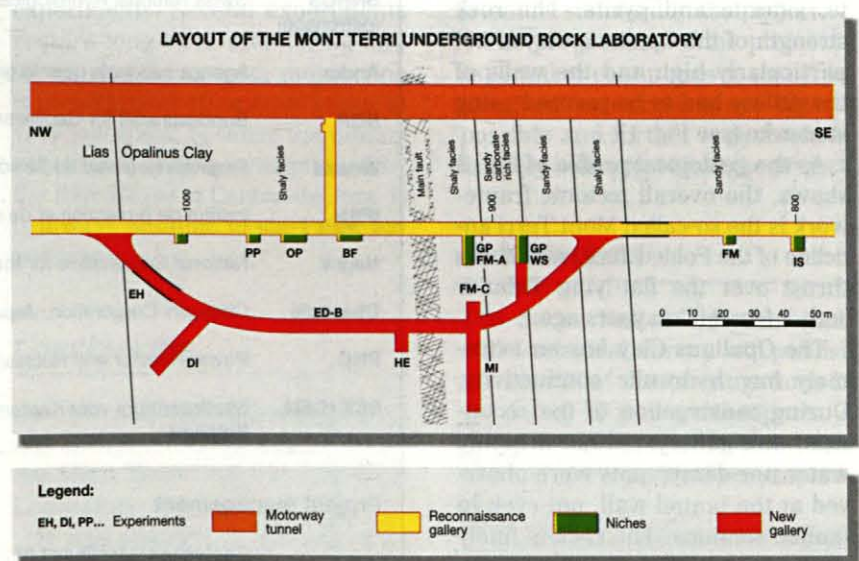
Layout of the Mont Terri underground rock laboratory, located in Opalinus Clay.
